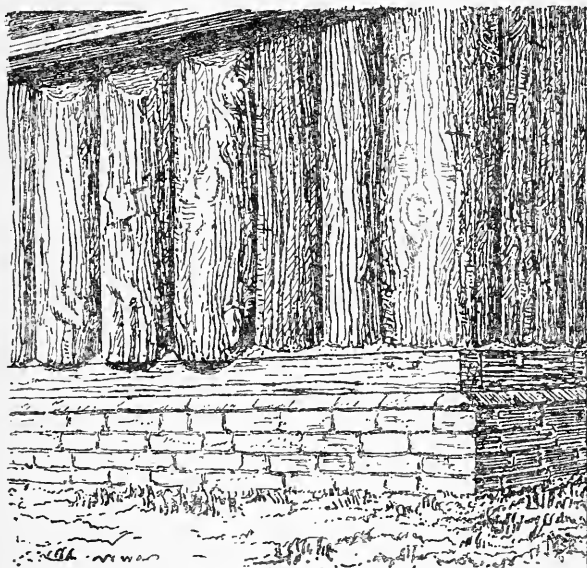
North-west corner of timber church at Greenstead, Essex.
